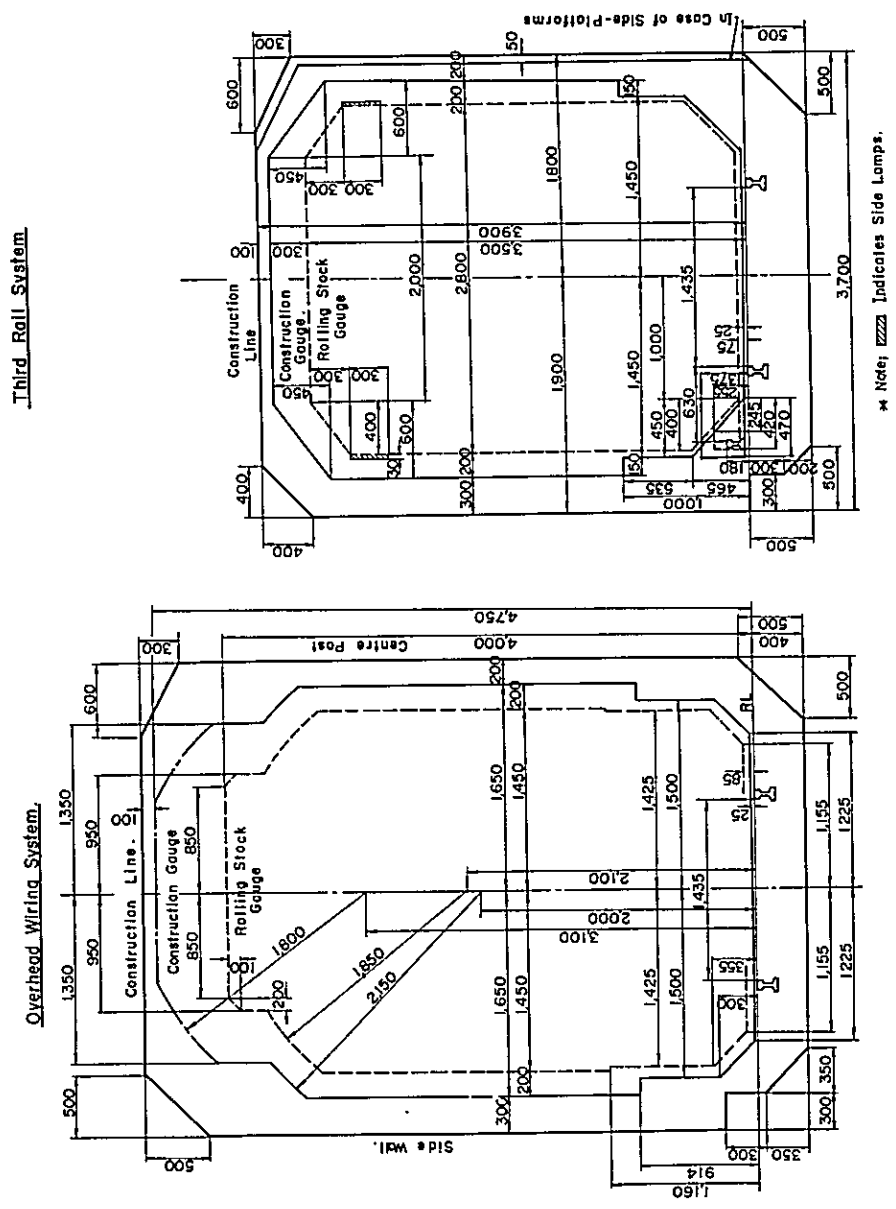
Construction Gauge and Rolling Stock Gauge
